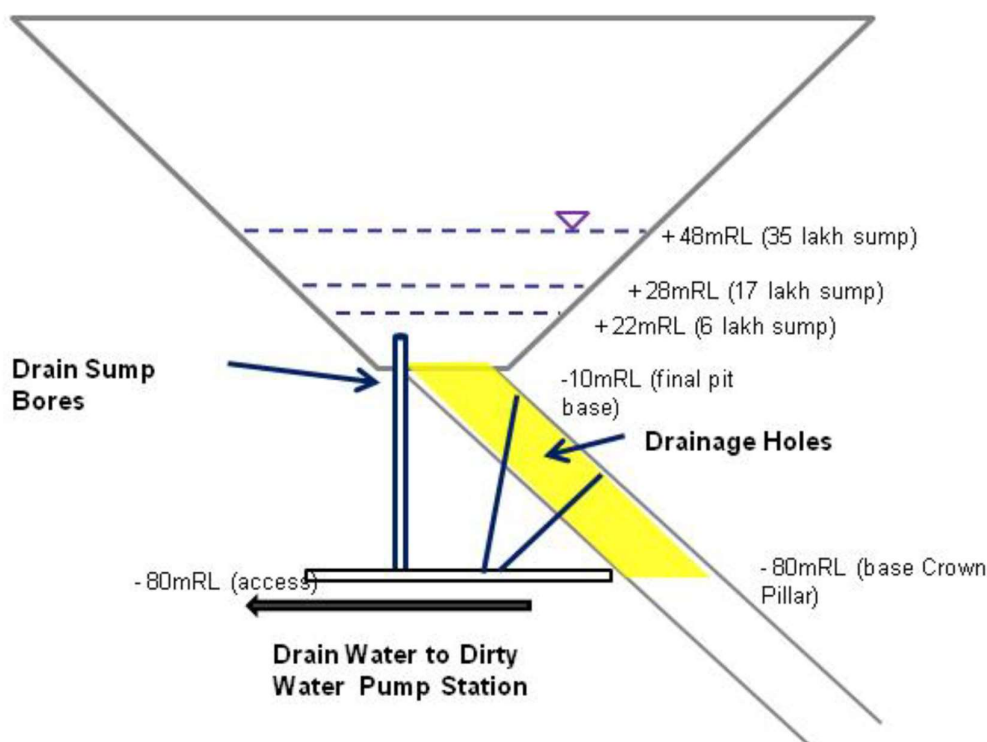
Schematic of Pit Drainage System Using Sump Bores
